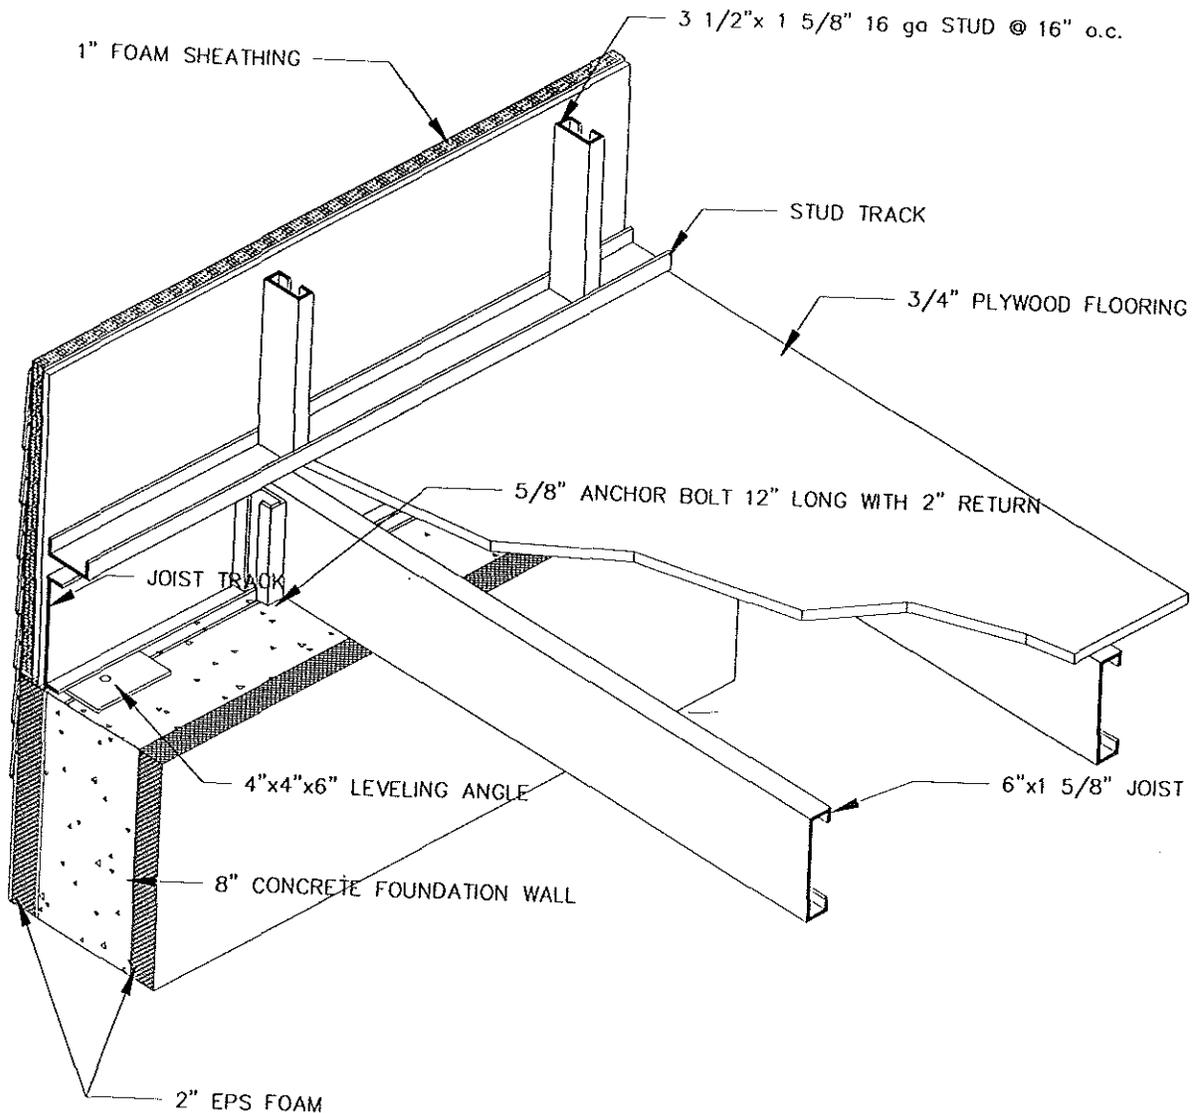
Wall-to-foundation detail, used on NAHB resource conservation house.
